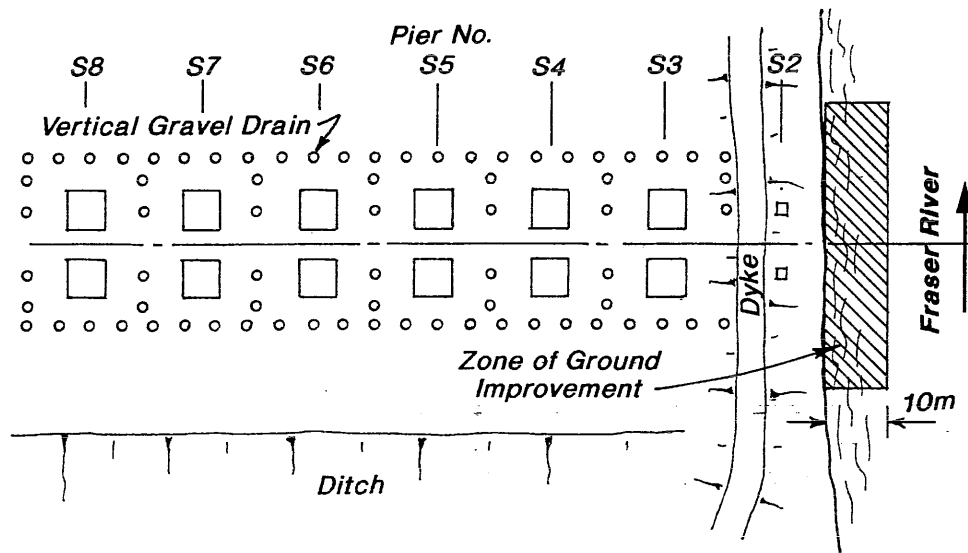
Area of Ground Improvement and Locations of Gravel Drains – Plan
